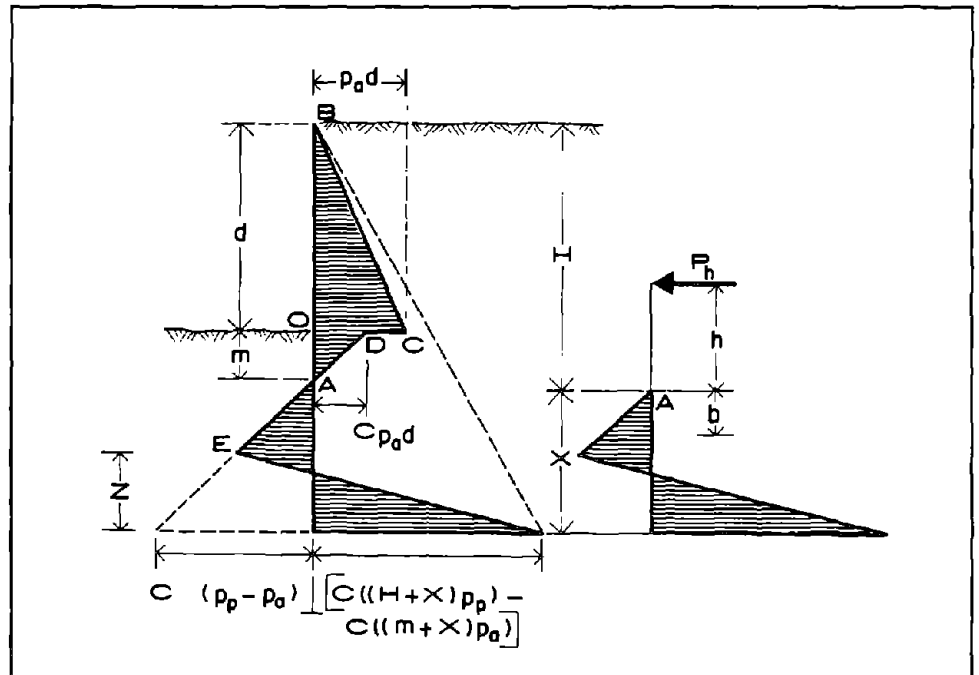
Earth pressure diagram for cantilever soldier pile wall.
